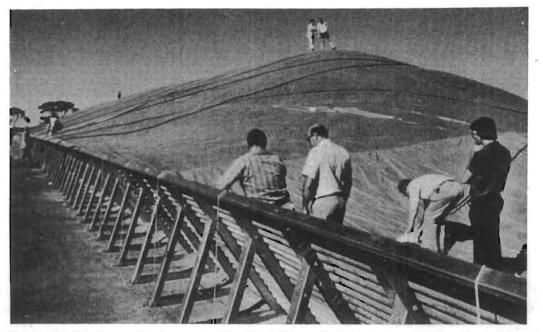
Bunker storage at Wyalkatchem showing the bulkhead type side walls constructed of portable steel frames.
